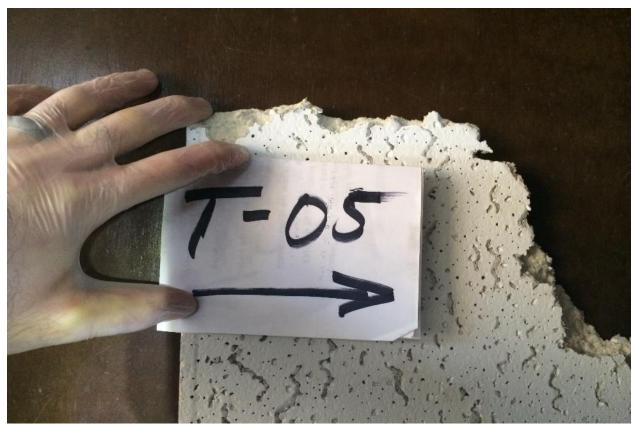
Laboratory analyses detected 2% chrysotile asbestos within suspended ceiling tile sample TS-06 collected from the Theatre Building hallway (sample should be labeled TS-06).
